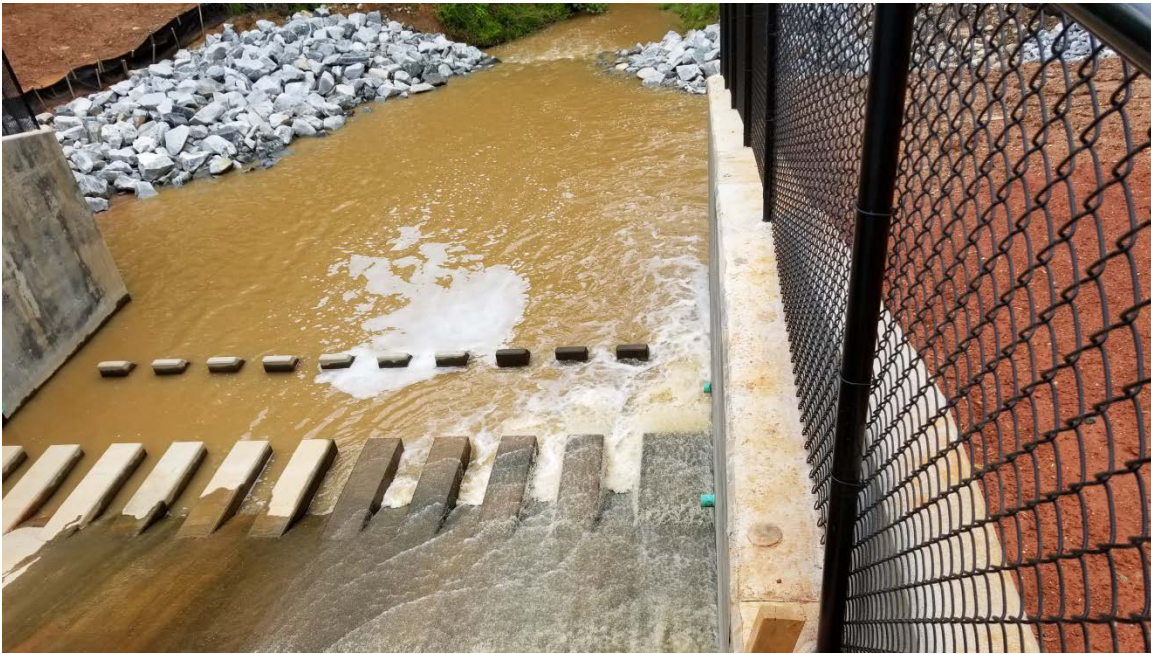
A fence and rock was placed at the project site, on the downstream side of the spillway. (04/26/2018)
